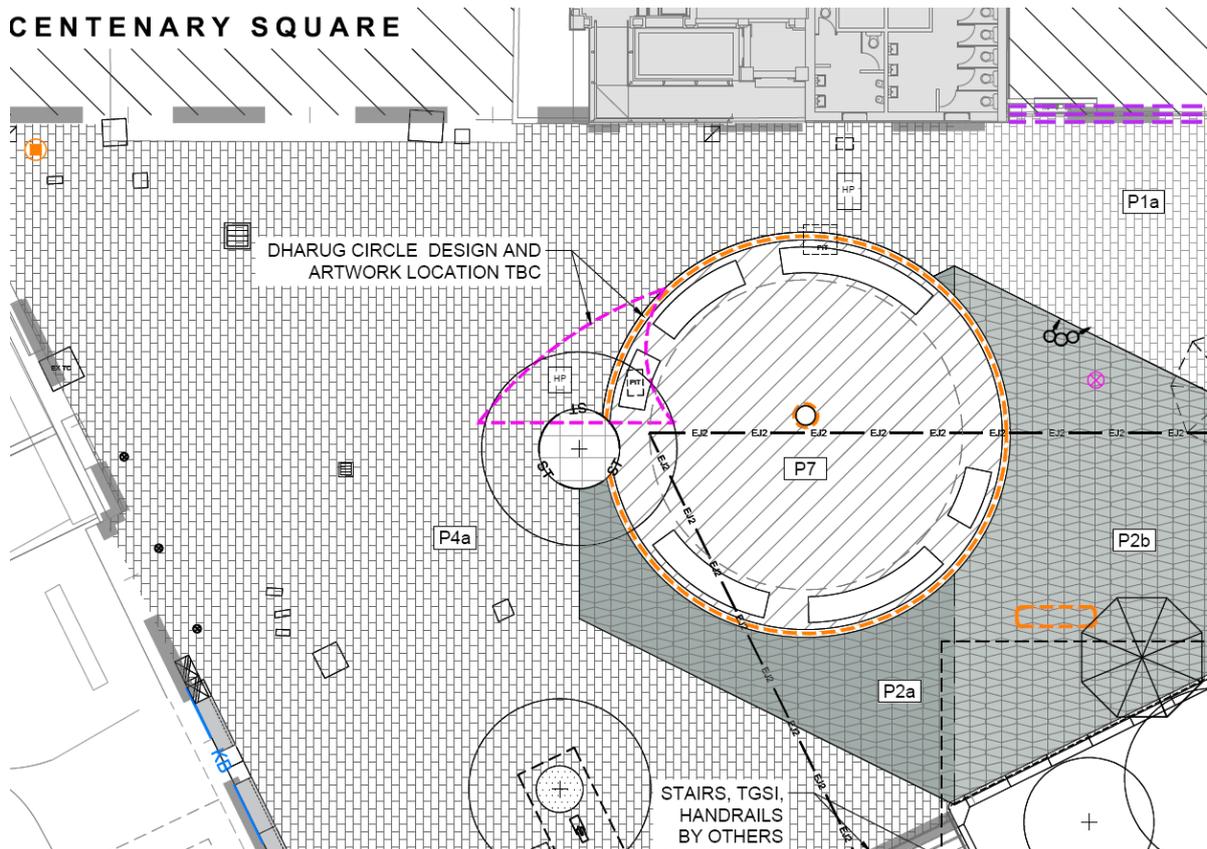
Proposed Aboriginal Meeting Place and Fig Tree Detail
